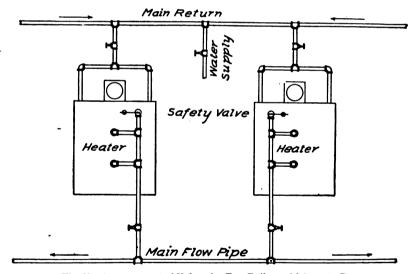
Arrangement of Valves for Two Boilers which are to Run Independently or Together.
